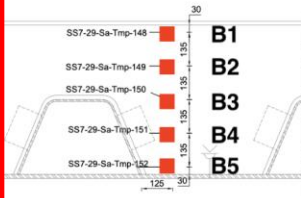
SCALE 1:10 TYPICAL DETAIL
